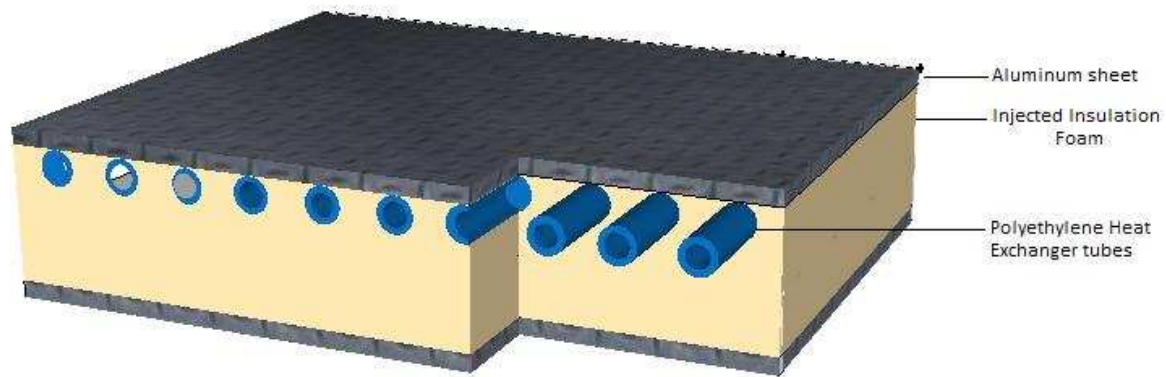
Cross sectional view of the Novel "Sandwich" Thermal Roof Collector
